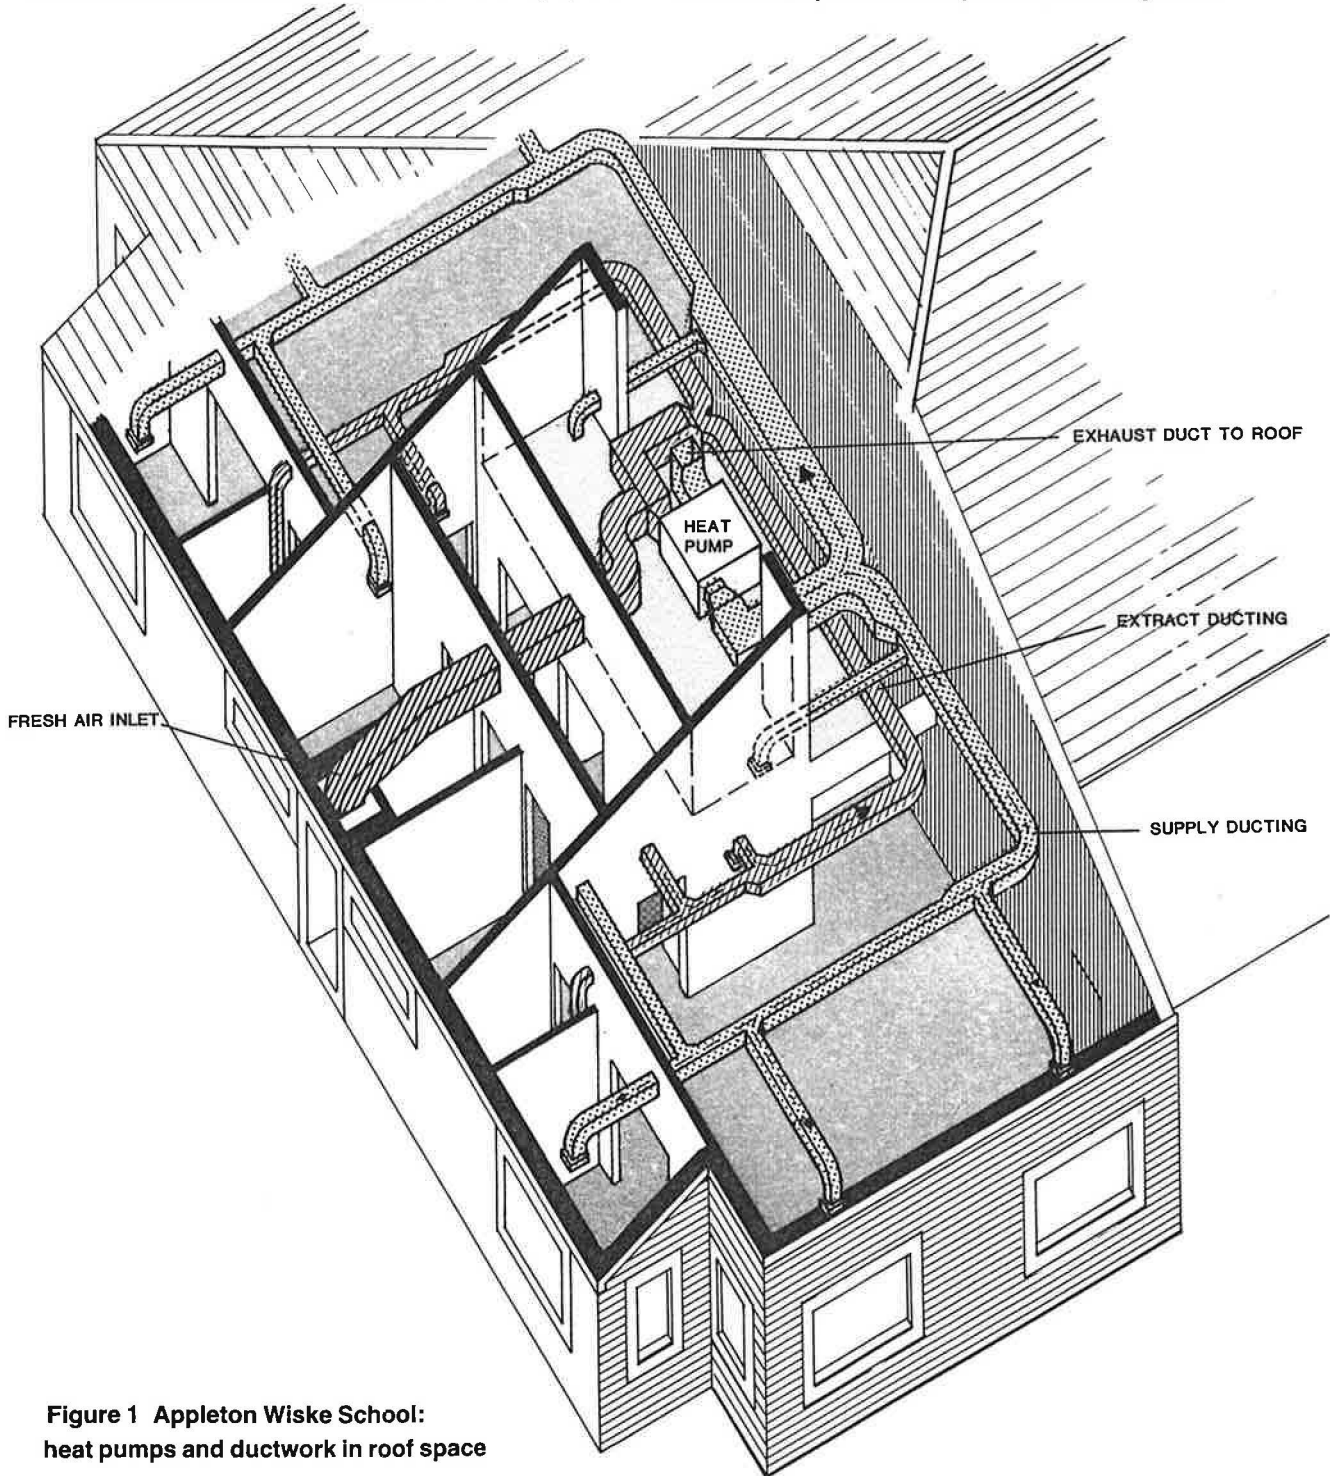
Appleton Wiske School: heat pumps and ductwork in roof space
